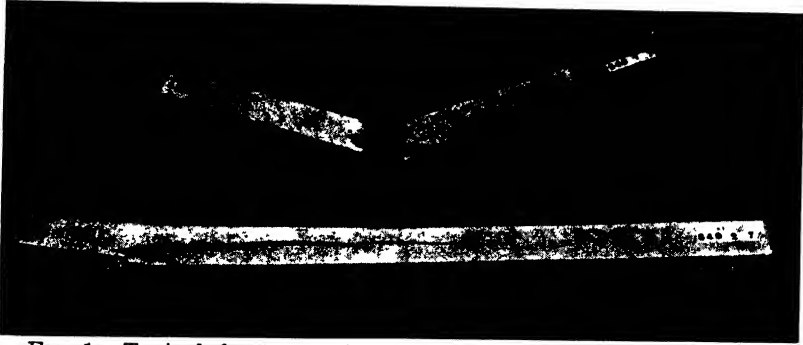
Typical fractures of centre-point and four-point bending specimens.
